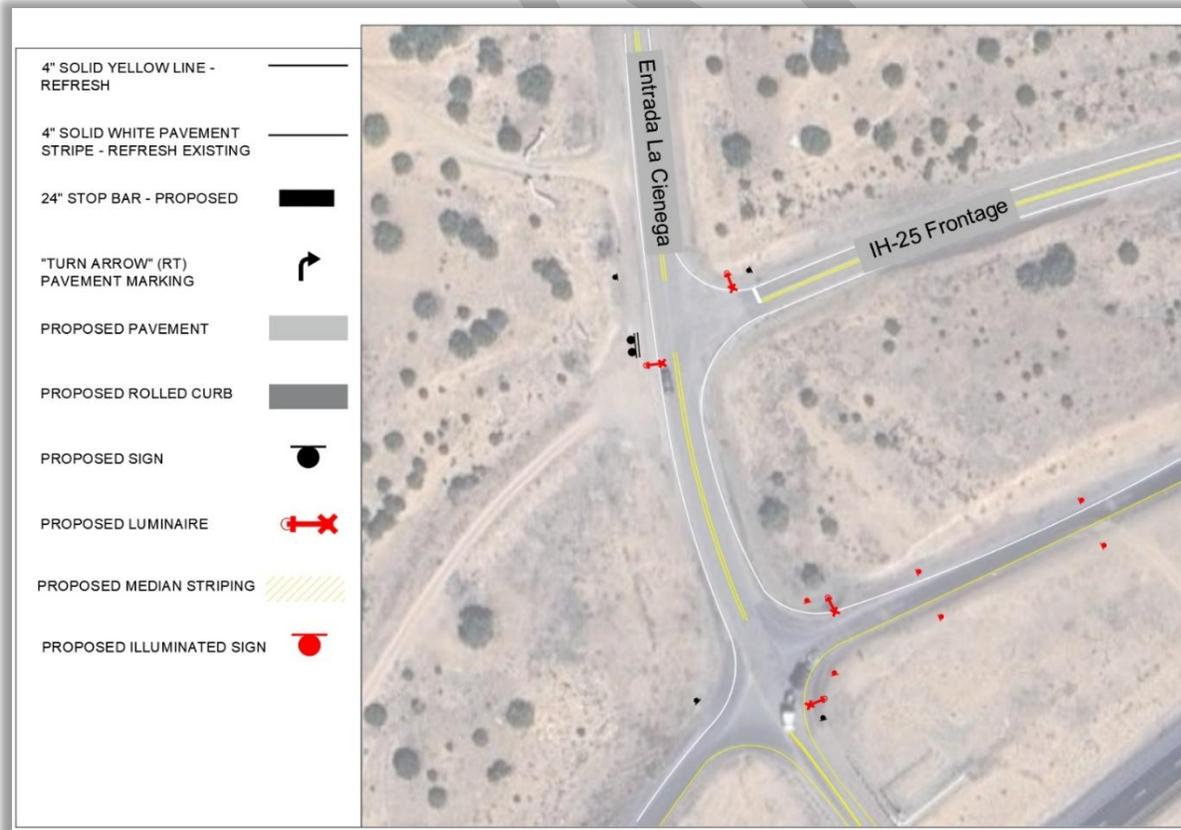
Conceptual Layout with proposed Luminaire locations (Entrada La Cienega & I-25 Frontage Road)
